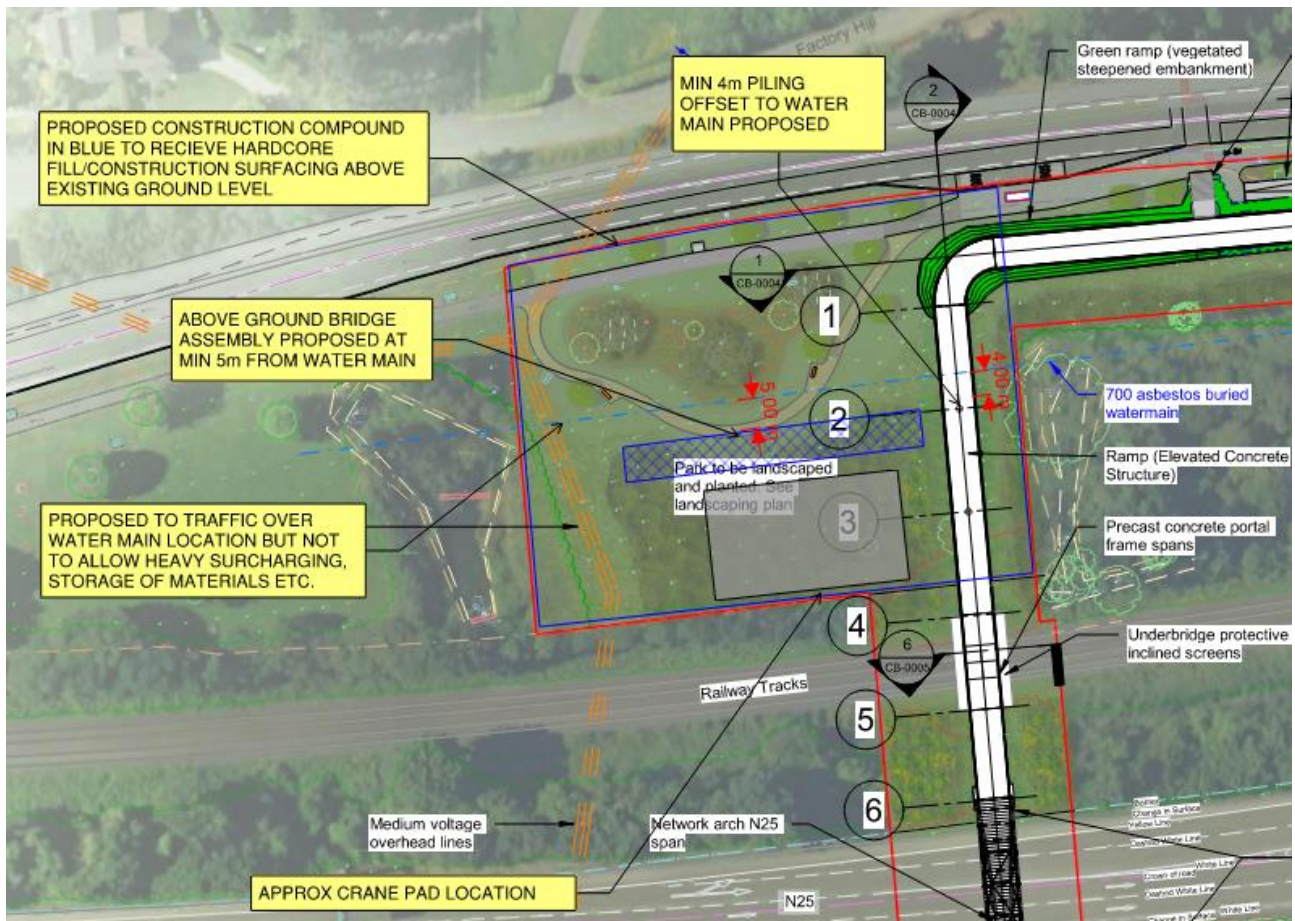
Proposed easement to underground water main running through bridge assembly area
